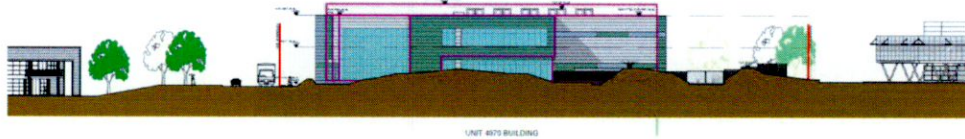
Extract from RKD Architects' Site Layout Plan, which clearly labels and illustrates the proposed amendments
